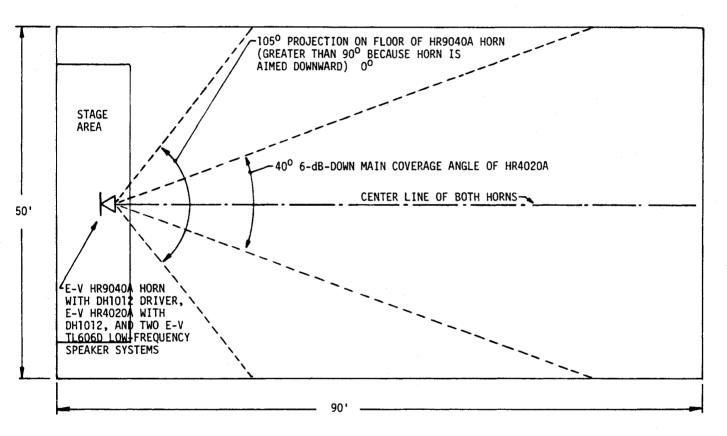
Plan View of Large Size Room, Permanent Installation
